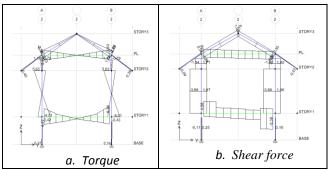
Internal force in beams, columns with forced anti-oblique addition along the house
